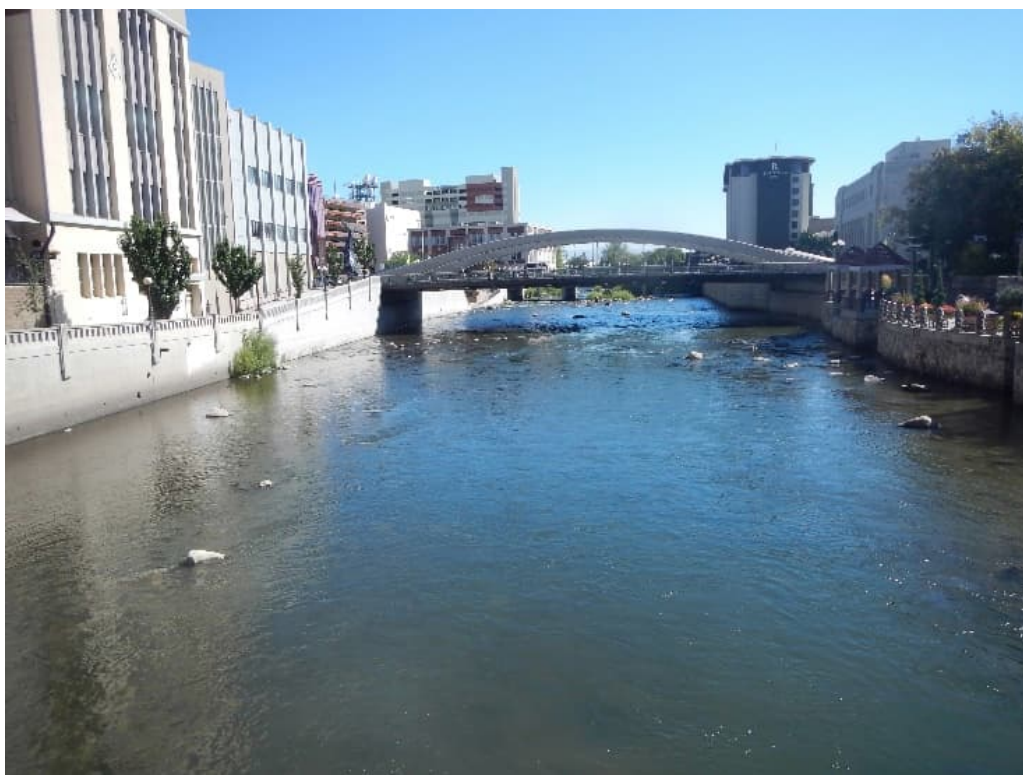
Facing downstream from the Sierra Street bridge toward the Virginia Street bridge.
